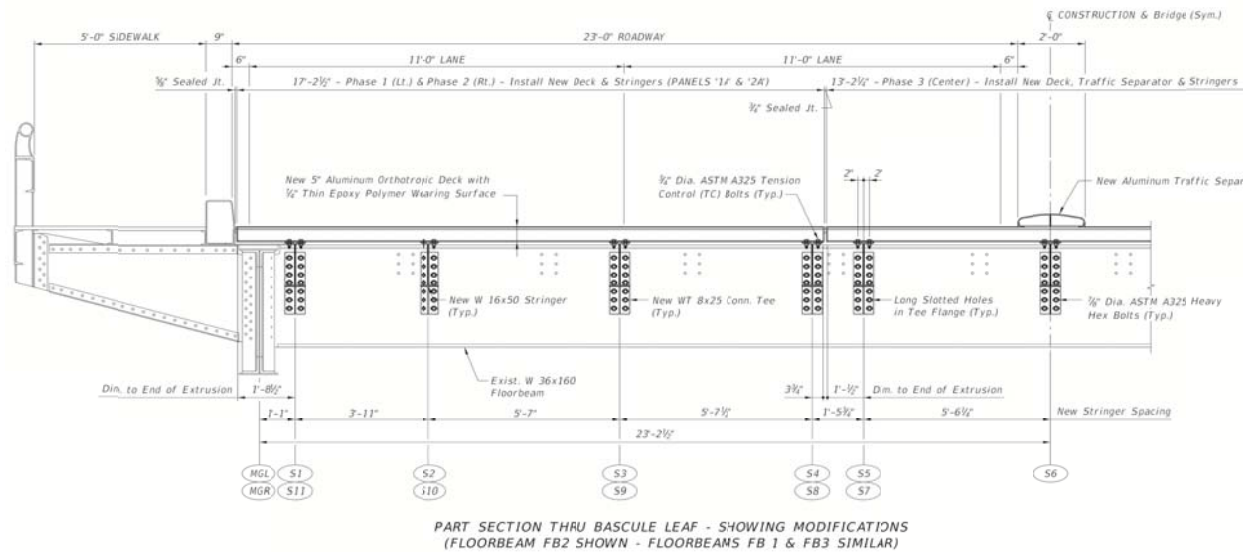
Typical Bascule Bridge Partial Transverse Section
